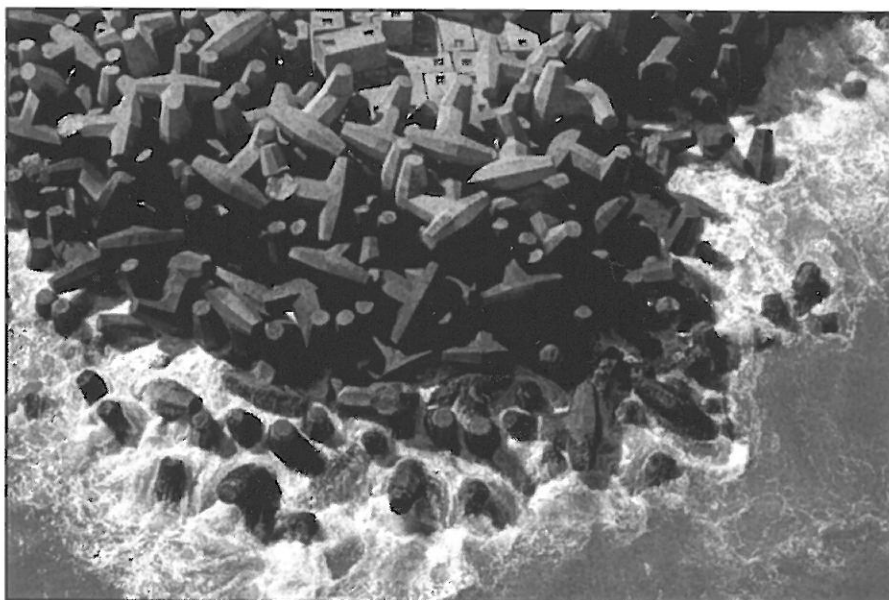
Cape Town Breakwater Spur – showing 30% damage
